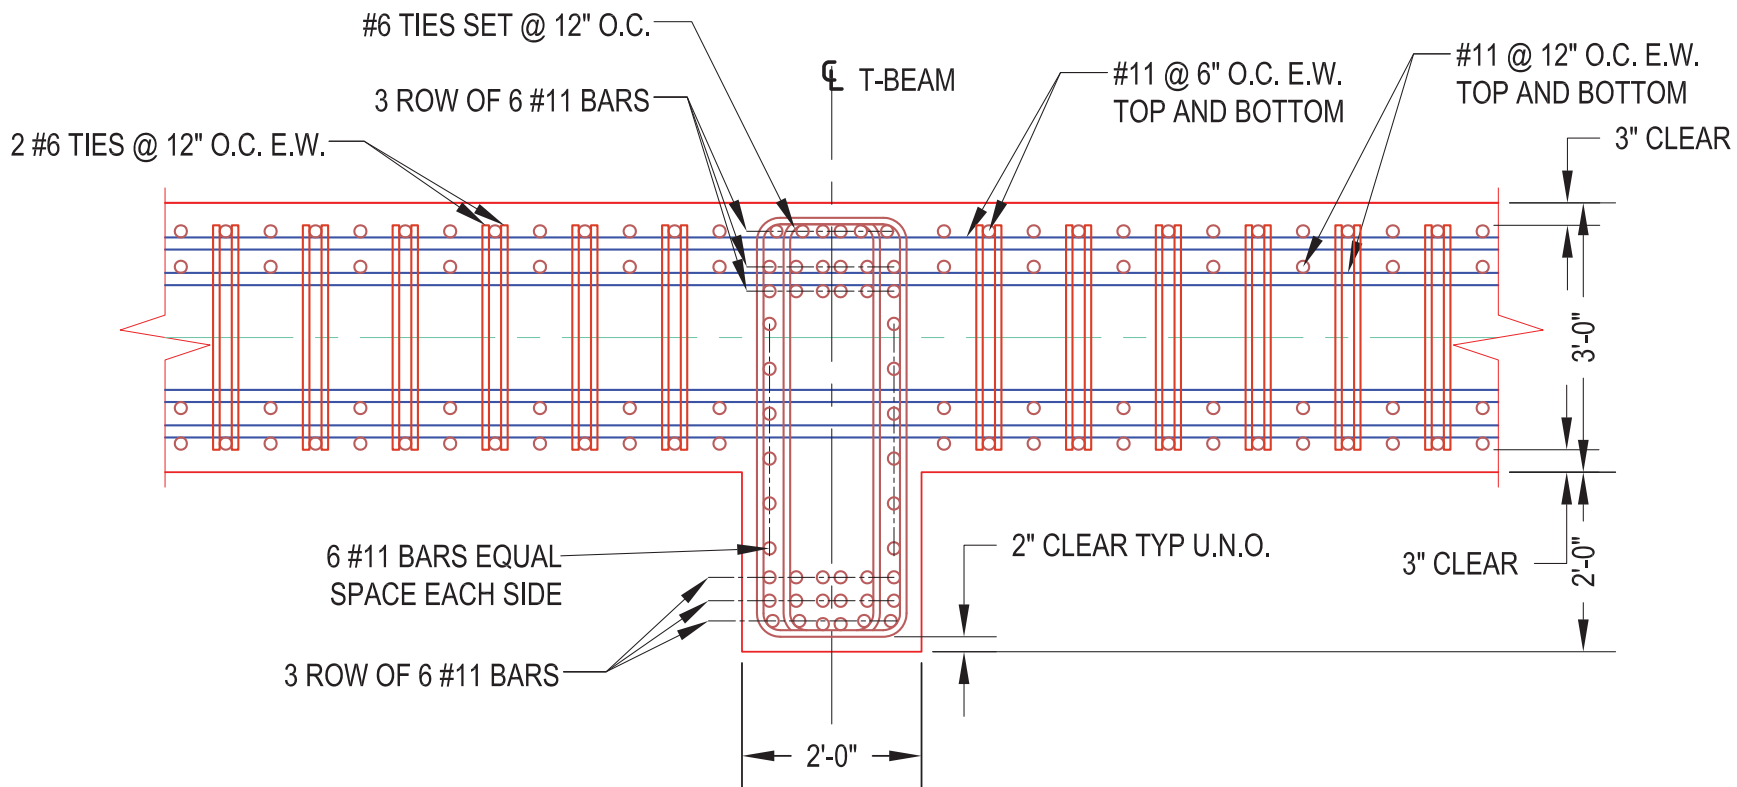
B-38: RXB Reinforcement Detail for Type 1 T-Beams at EL 75'-0"
